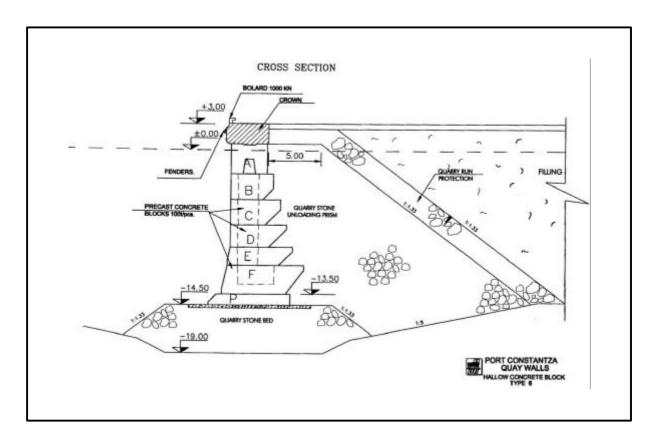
Standard Pier Type referred to Unloading Berth (Type 1 and Type 6)
